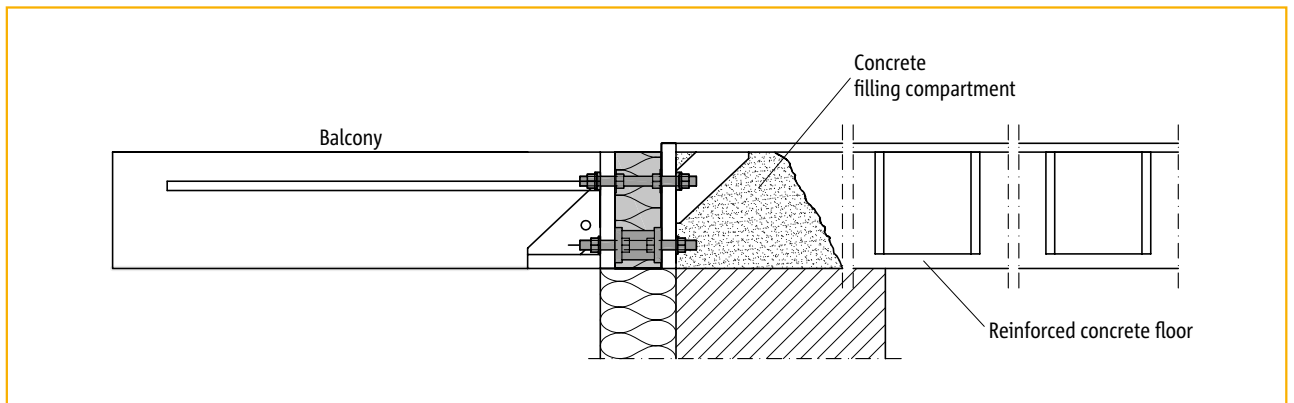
Balcony freely cantilevered, connected with type KST (in-situ concrete)
